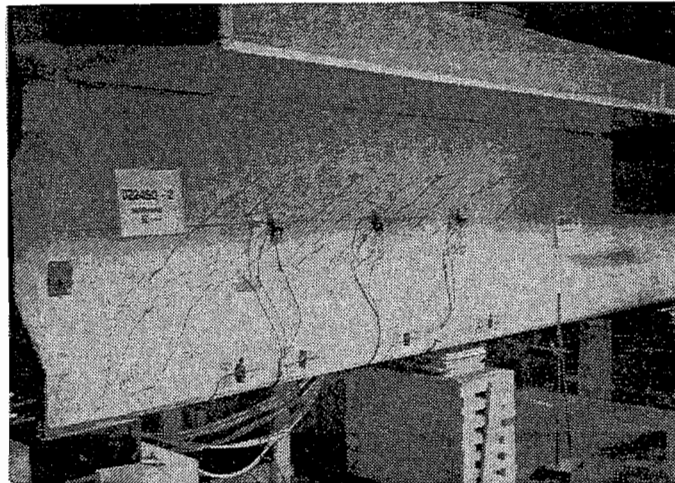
Web Shear Cracking Pattern, South Shear Span of DZ2450-2
